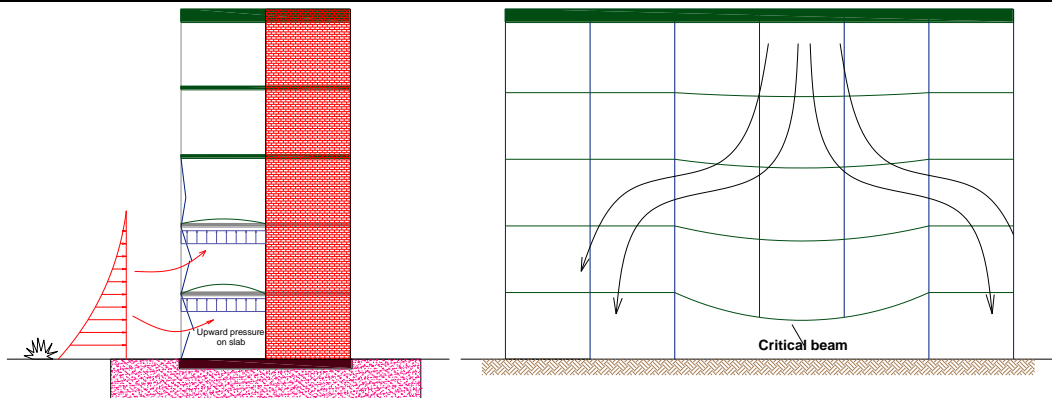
Uplift Loads for Slabs on the Structures Subject to Blast Loads
